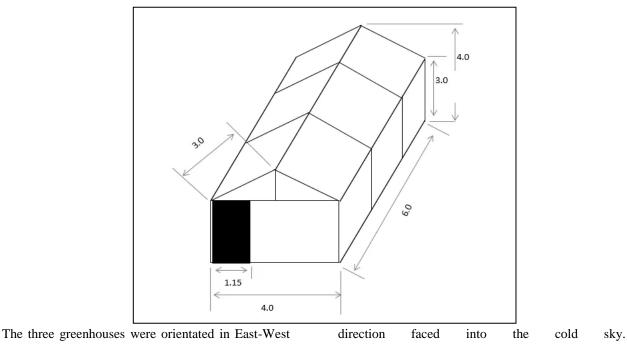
The schematic diagram of gable-even-span greenhouse.
